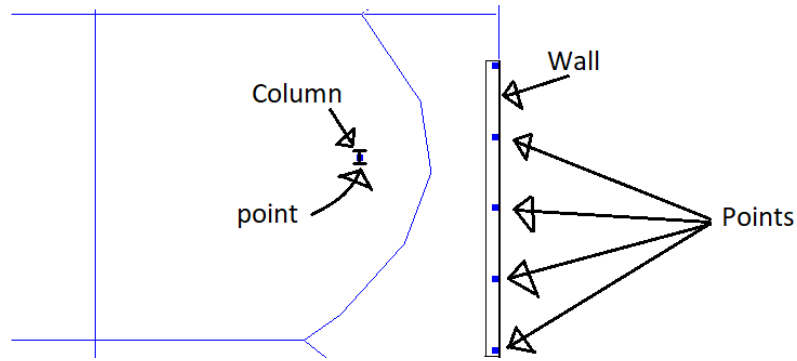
Wall and column modeled as points for use in Voronoi diagram, where the blue lines are the Voronoi surface being split into smaller surfaces.
